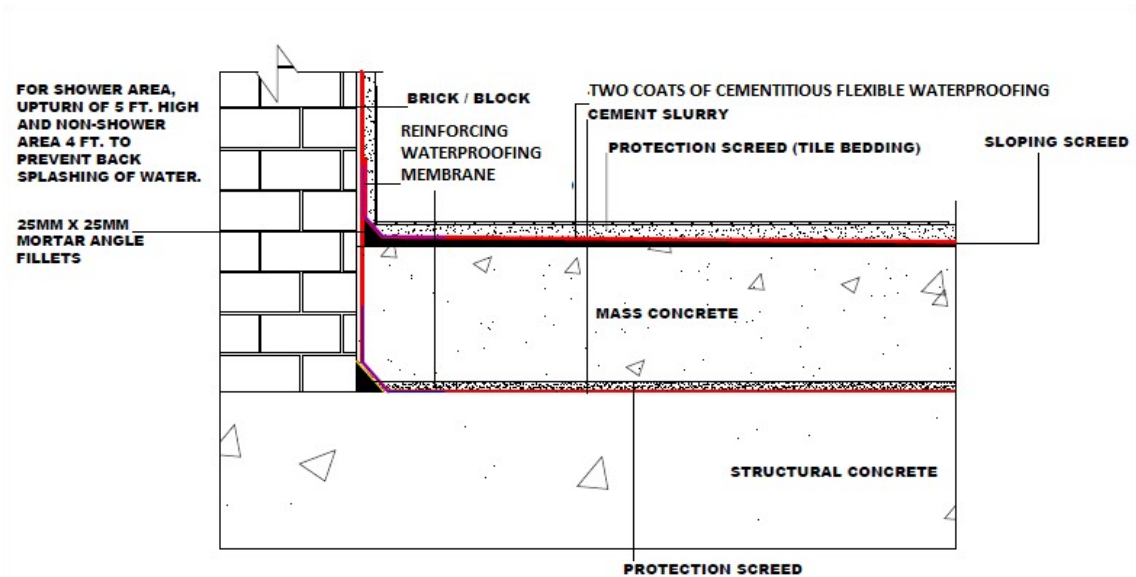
Waterproofing of Bathrooms and Toilets (Double Layer System)
